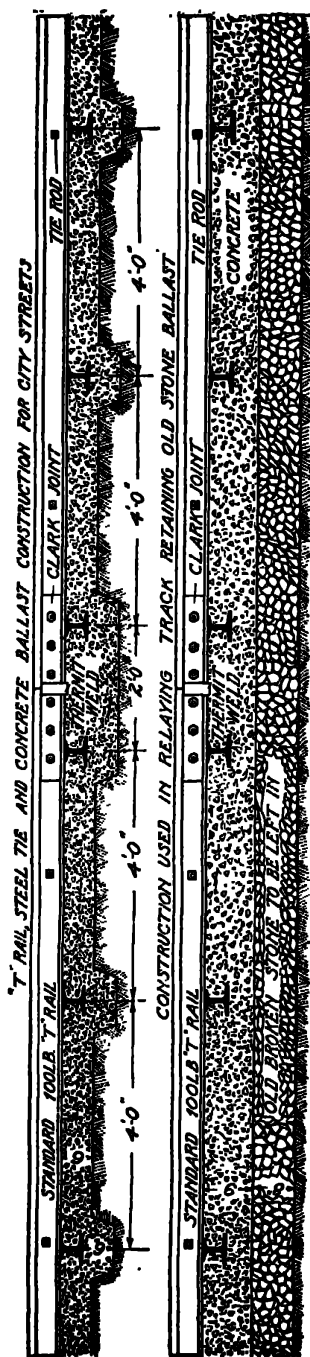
Longitudinal and Transverse Section of Steel Tie Track Bed
